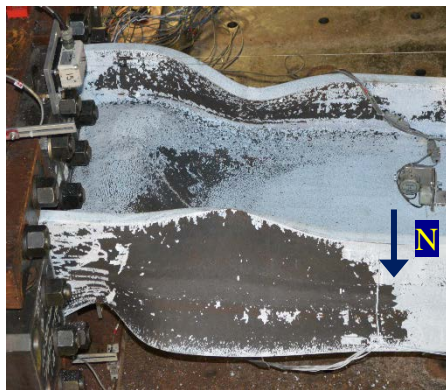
Specimen 11M: Column Fracture at End of Test (Northeast Flange)
